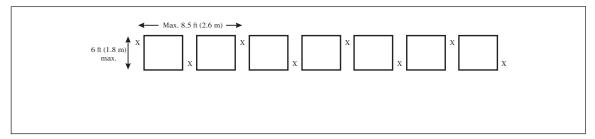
Plan view of alternative in-rack sprinkler arrangement for single-row racks up to 6 ft (1.8 m) deep
